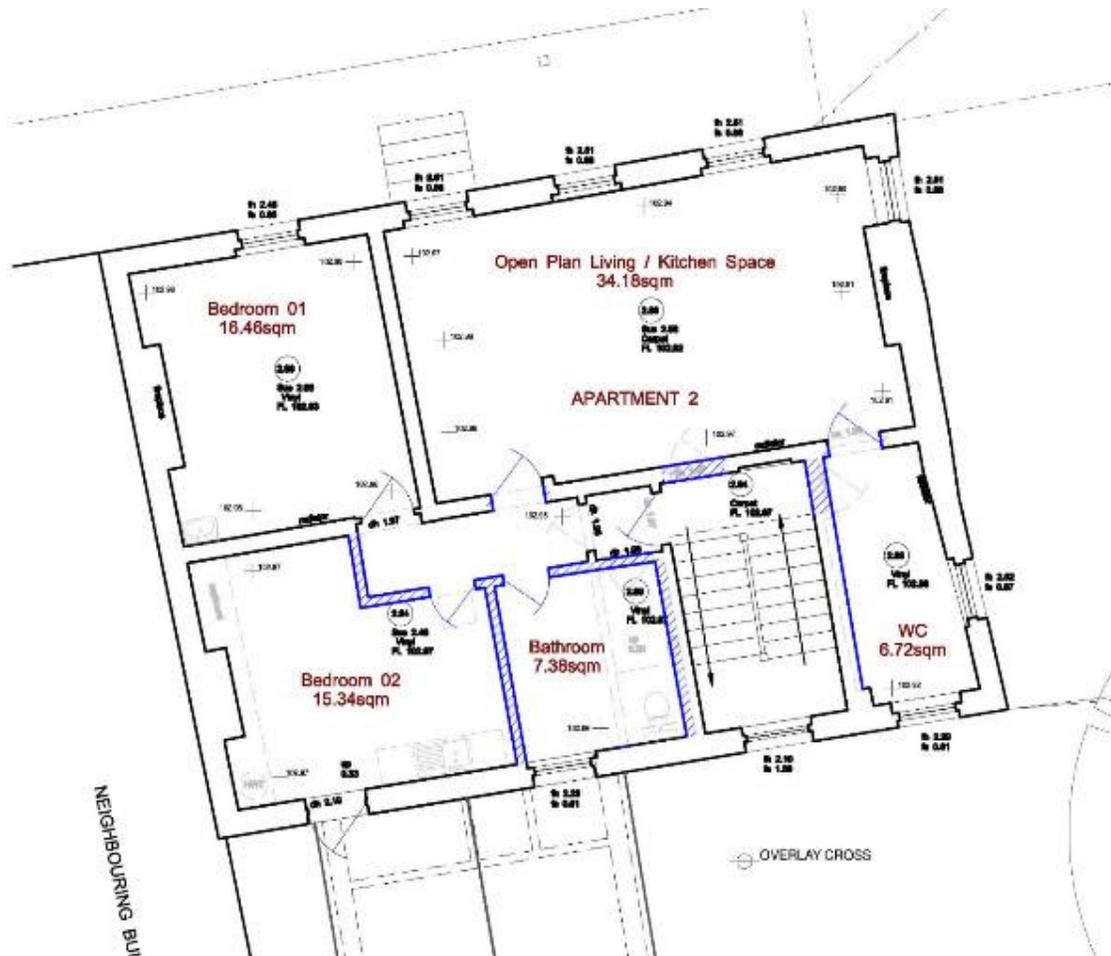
Proposed First Floor Plan (close up) showing proposed alterations.
